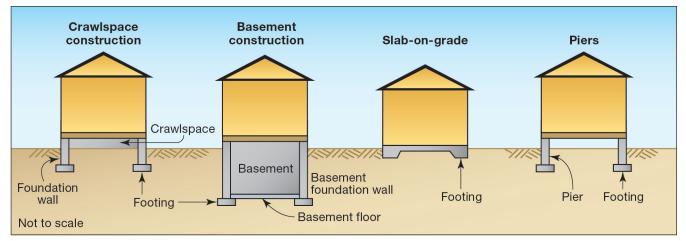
The four foundation types represented in this figure are crawlspace construction, basement construction, slab-on-grade, and piers.
